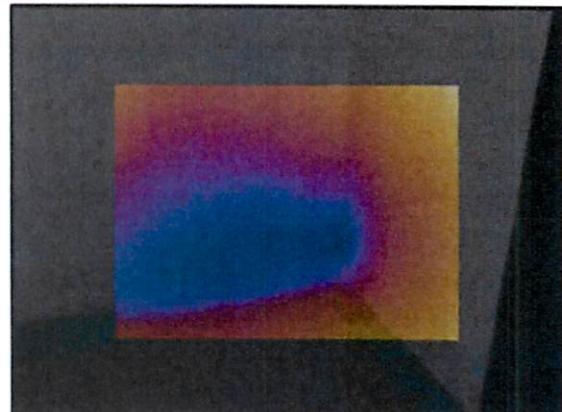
South wing restroom, shower area, evidence of residual moisture in wall system as viewed through IR camera
